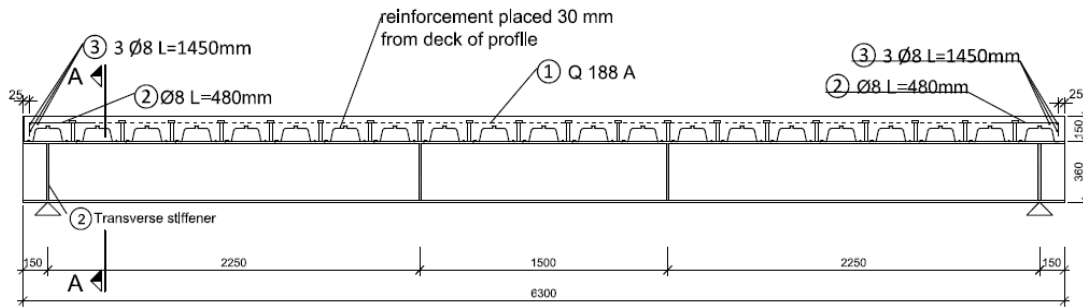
Test on 6m span composite IPE 360 beam with single shear connectors per 80mm deep deck rib (load points at 2.25m from the supports)
